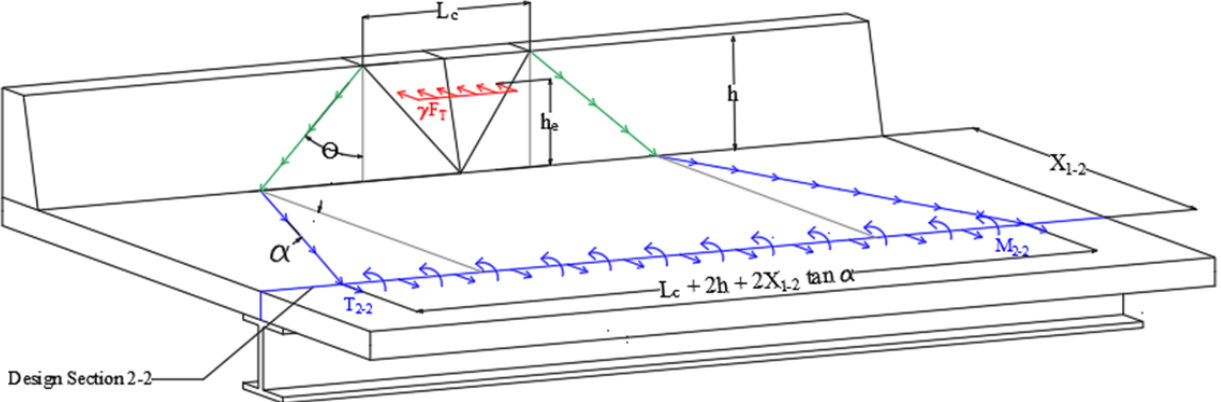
Generic Bridge Rail Deck Loading - Design Case 1, Section 2-2
